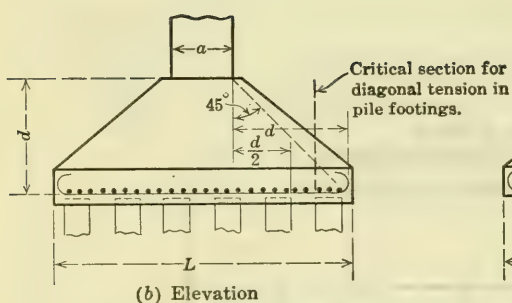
TYPICAL SLOPED REINFORCED CONCRETE FOOTING ON PILES.
